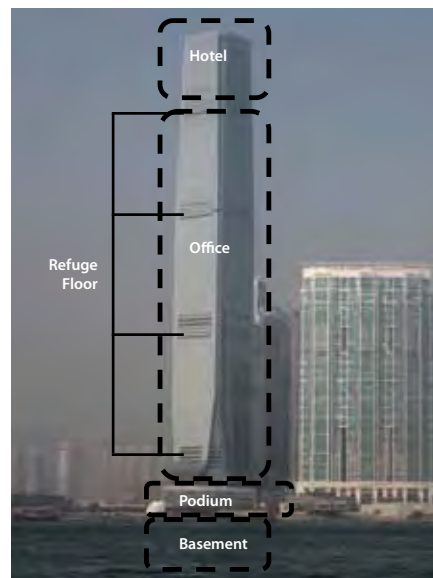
The zoning arrangement of the fire detection system in Supertall Building B. © Authors
